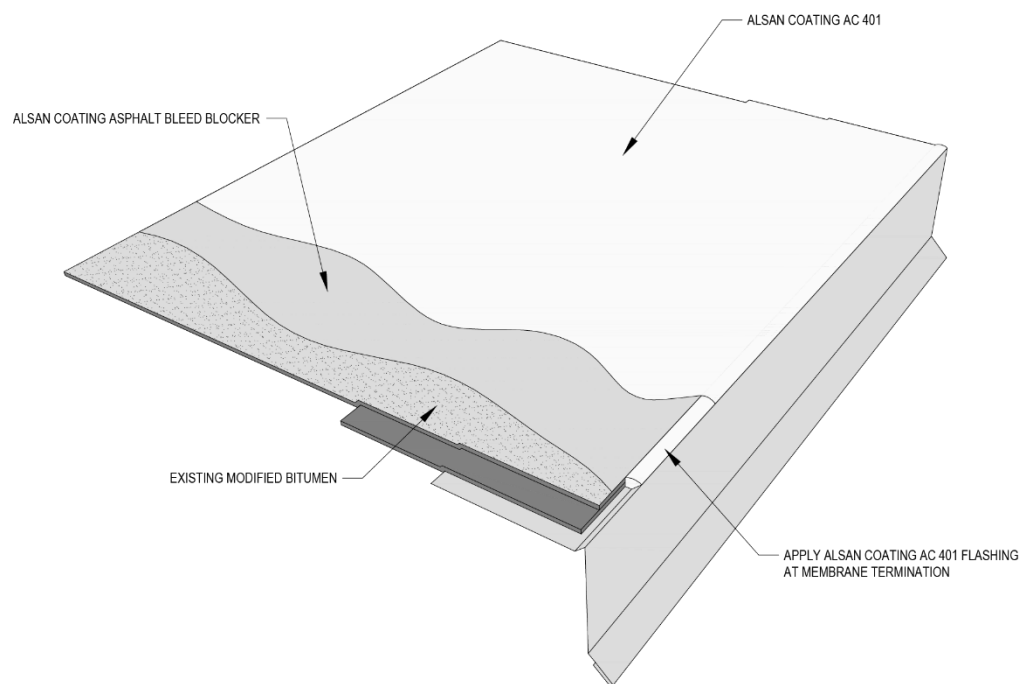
Acrylic Roof Coating Over SBS Modified Bitumen, Edge
